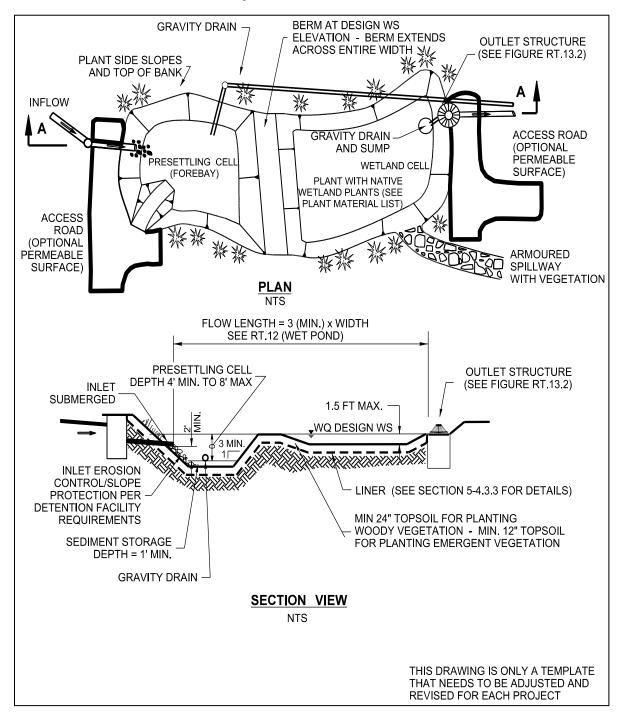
Constructed stormwater treatment wetland: Plan/Section view
